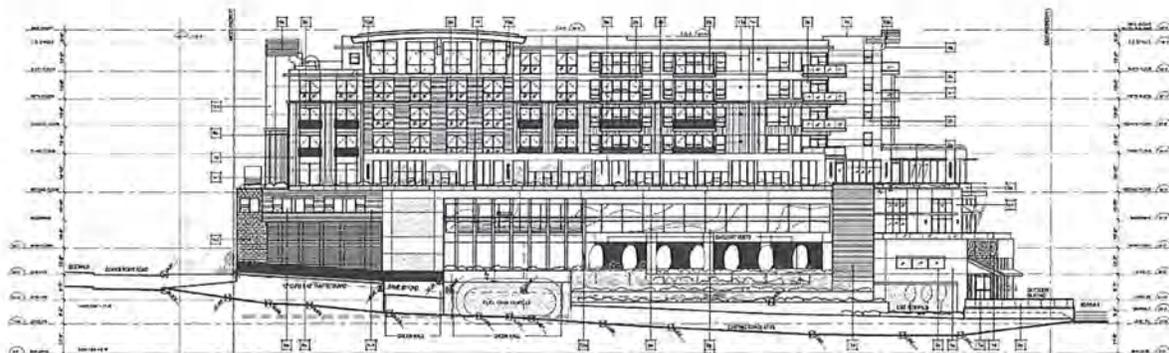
Hotel south elevation showing variation in material and landscape elements (drawing A9.0.1)
